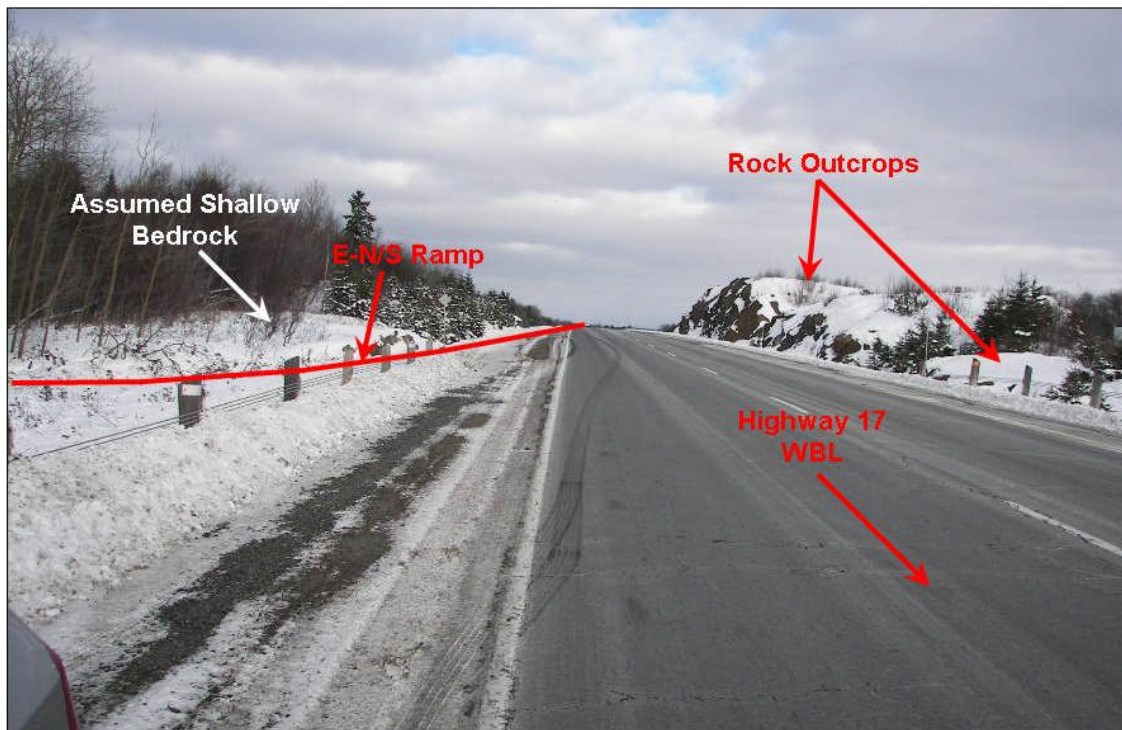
VIEW: Looking west from south shoulder of Highway 17 EBL about 700 m east of existing SMR3 underpass at approximate location of new SMR3/SMR55 I/C underpass. Widening for N-E ramp required. S-W ramp on rock cut under future north span. Note Highway 17 WBL at higher level than EBL. (Dec. 6, 2007)
